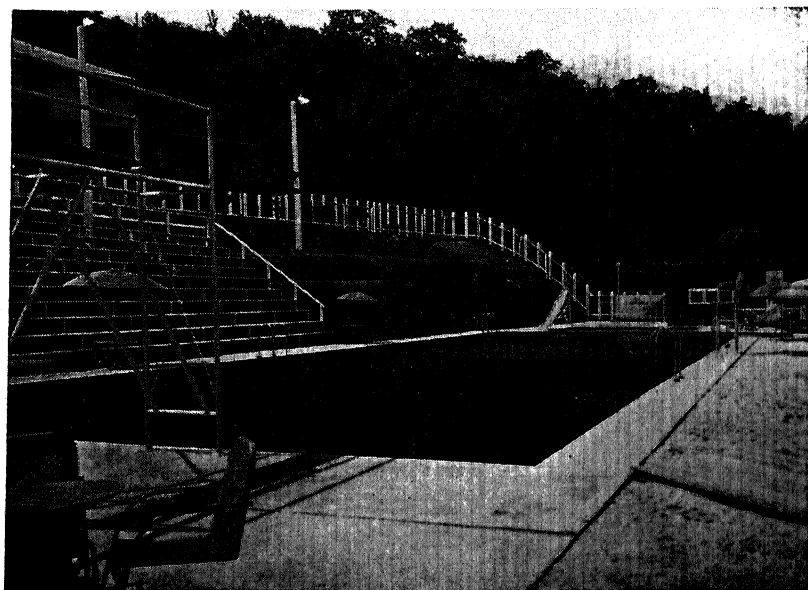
Arc welding is used extensively in the construction of swimming pool tanks. This arc welded tank, 100 ft. long by 40 ft. wide, is located at a remote mountain resort. Bottom and side plates are $\frac{1}{4}$ -in. except at deep end where they are $\frac{5}{16}$ -in. Plates are supported on and are stiffened by I beams.
